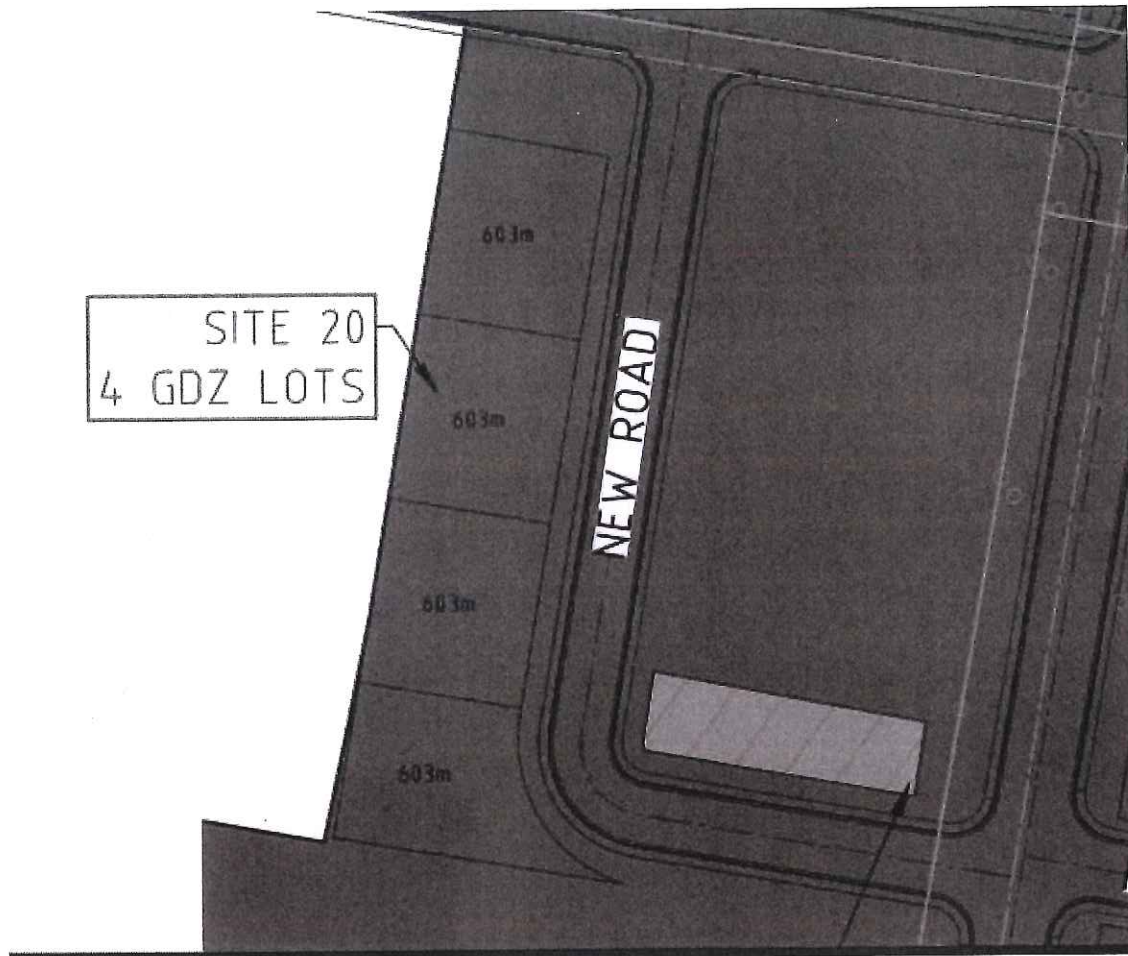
Ross Development Precinct Masterplan off Bond Street (2)
